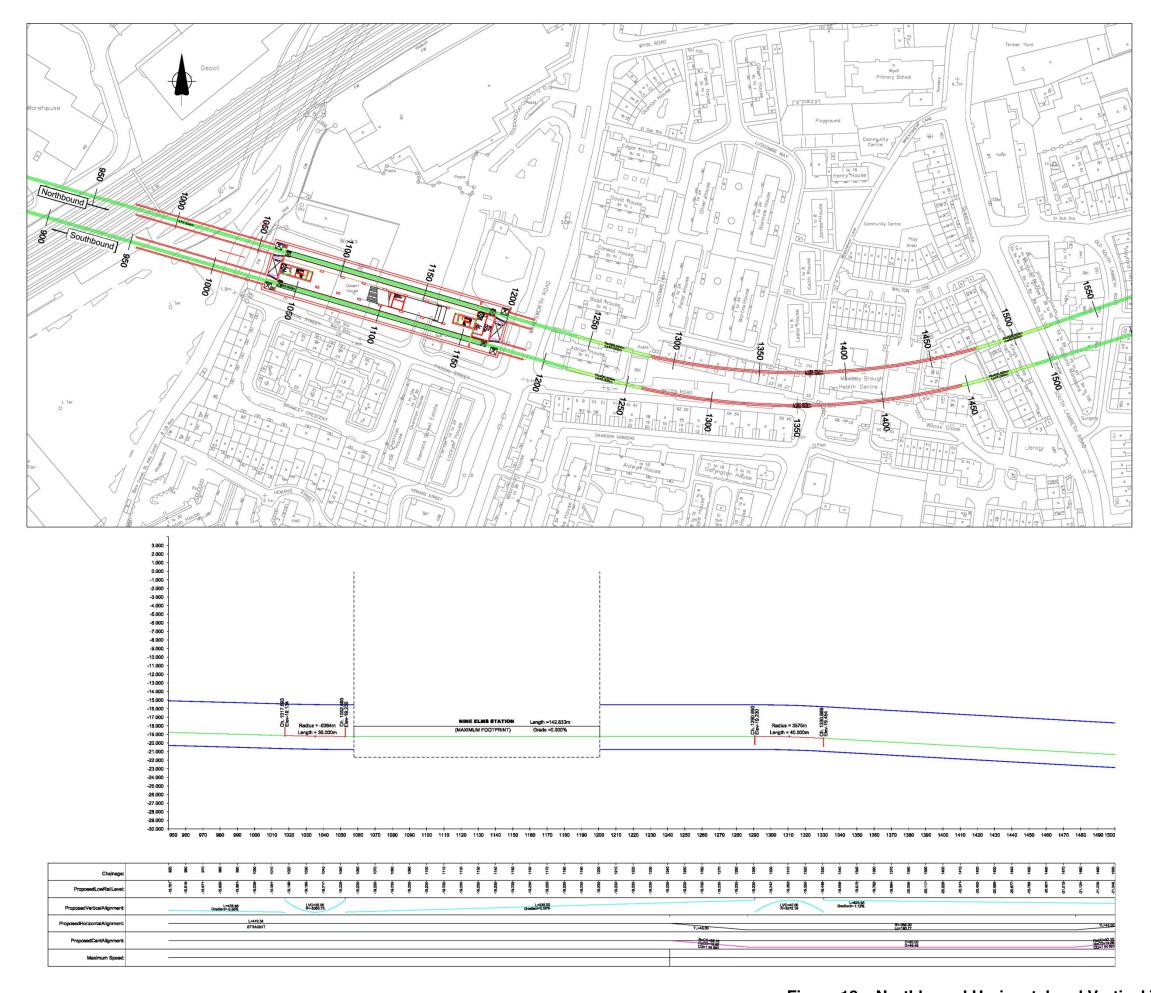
Northbound Horizontal and Vertical Track Alignment Sheet 3
